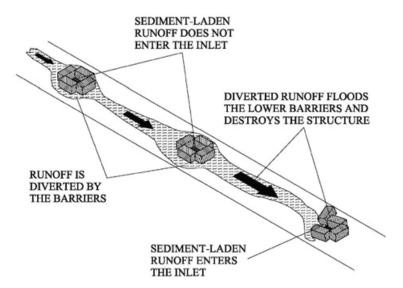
Inlet Protection Failure (FDEP 2008).
